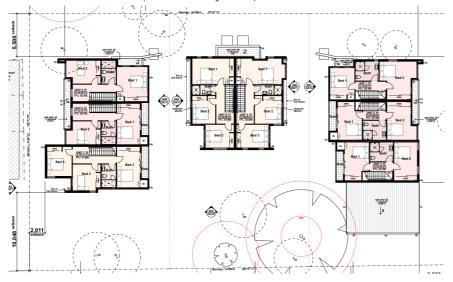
Extract from Architectural Plans – Site & External Works Plan – First Floor (Source: Architectural Plans, Stanton Dahl Architects, dated 16 June 2023)
